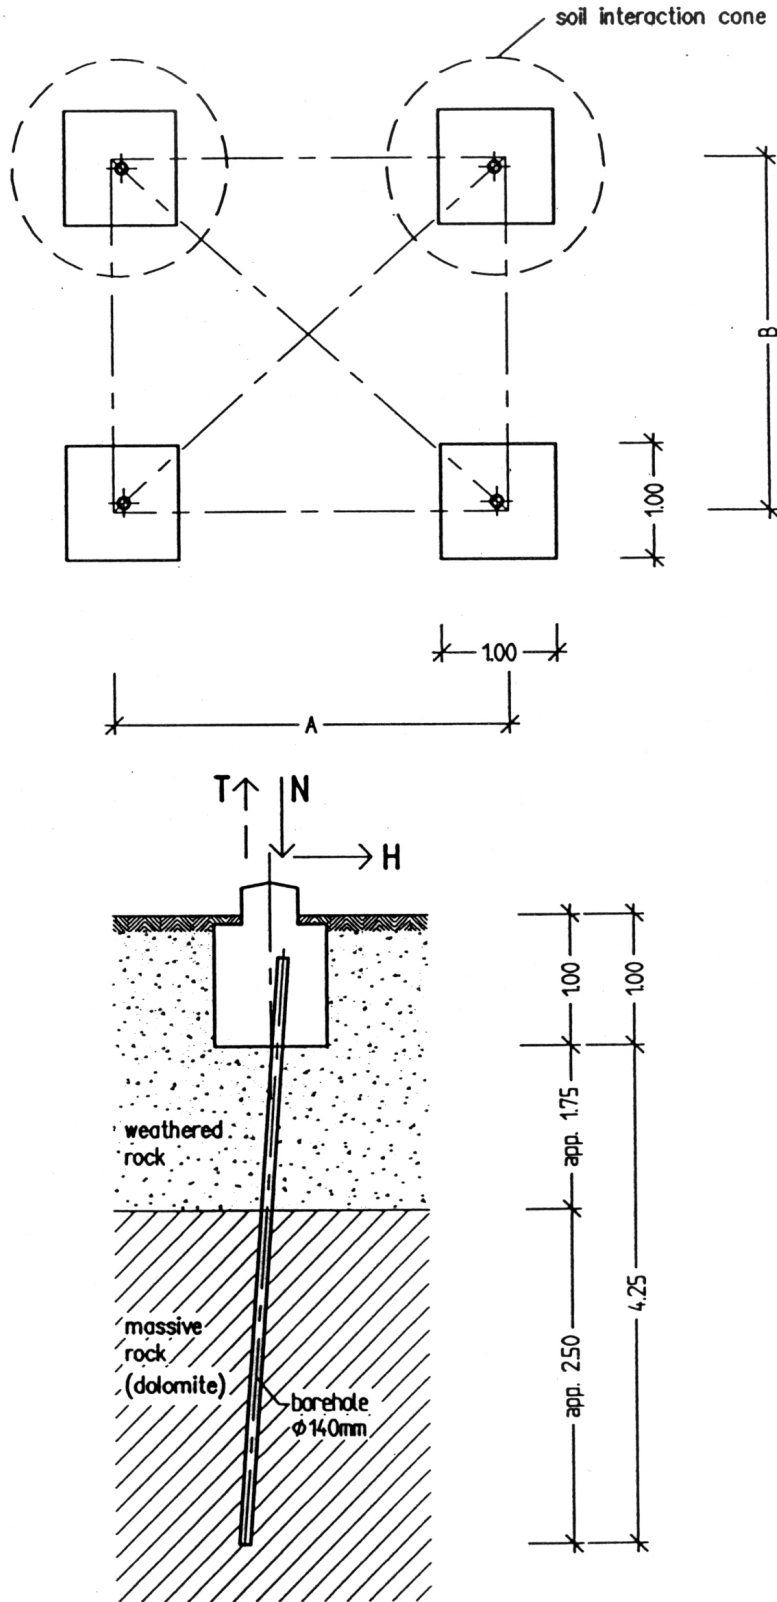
Micropile rock foundation, reinforced concrete block head
